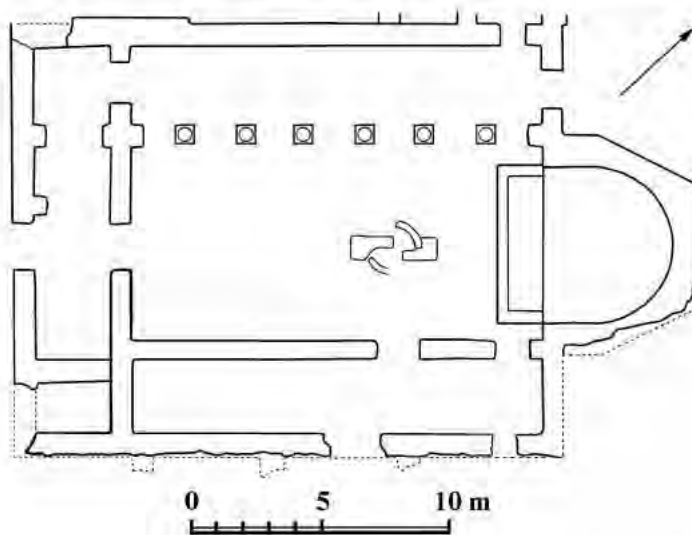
Church No. 28, from a Site Plan of 1861. The wall over the south stylobate is a later addition (after D. Ainalov [21, fig. 44]).
